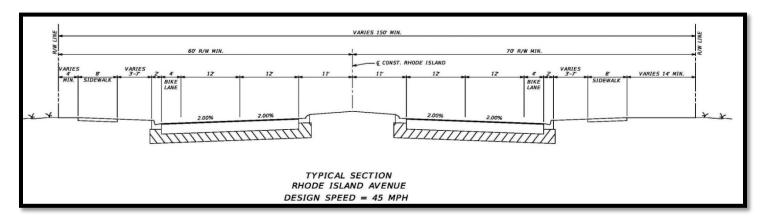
Proposed Rhode Island Avenue Typical Section
